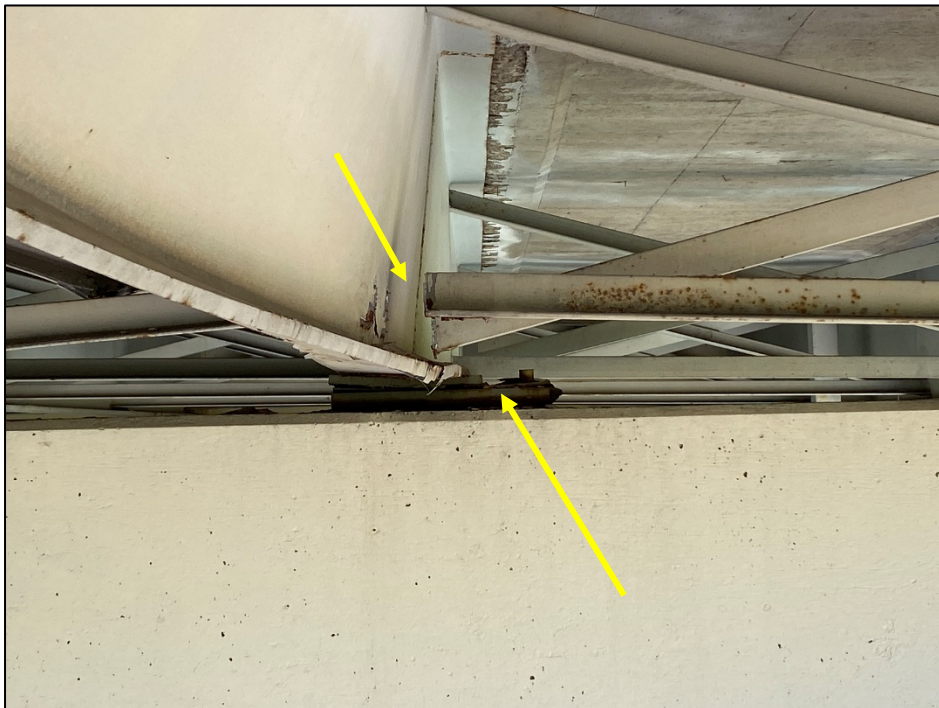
Beam 2 over pier 1 – note beam deflection, broken crossframe, shifting on sliding plate bearing and deck spalling in span 1.
